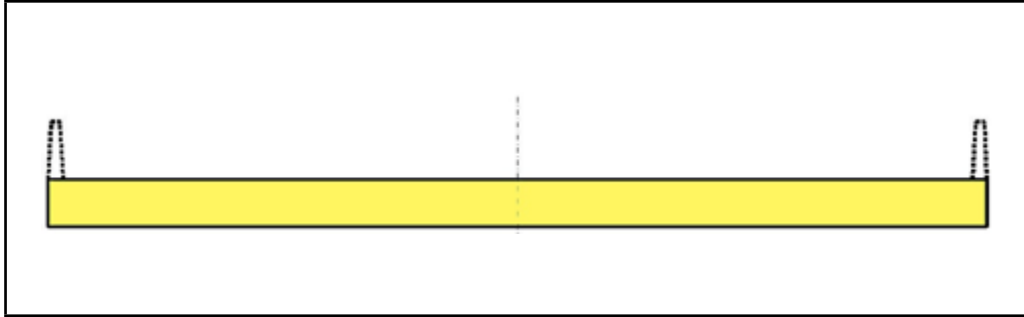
Reinforced Concrete Slab (Highlighted)
